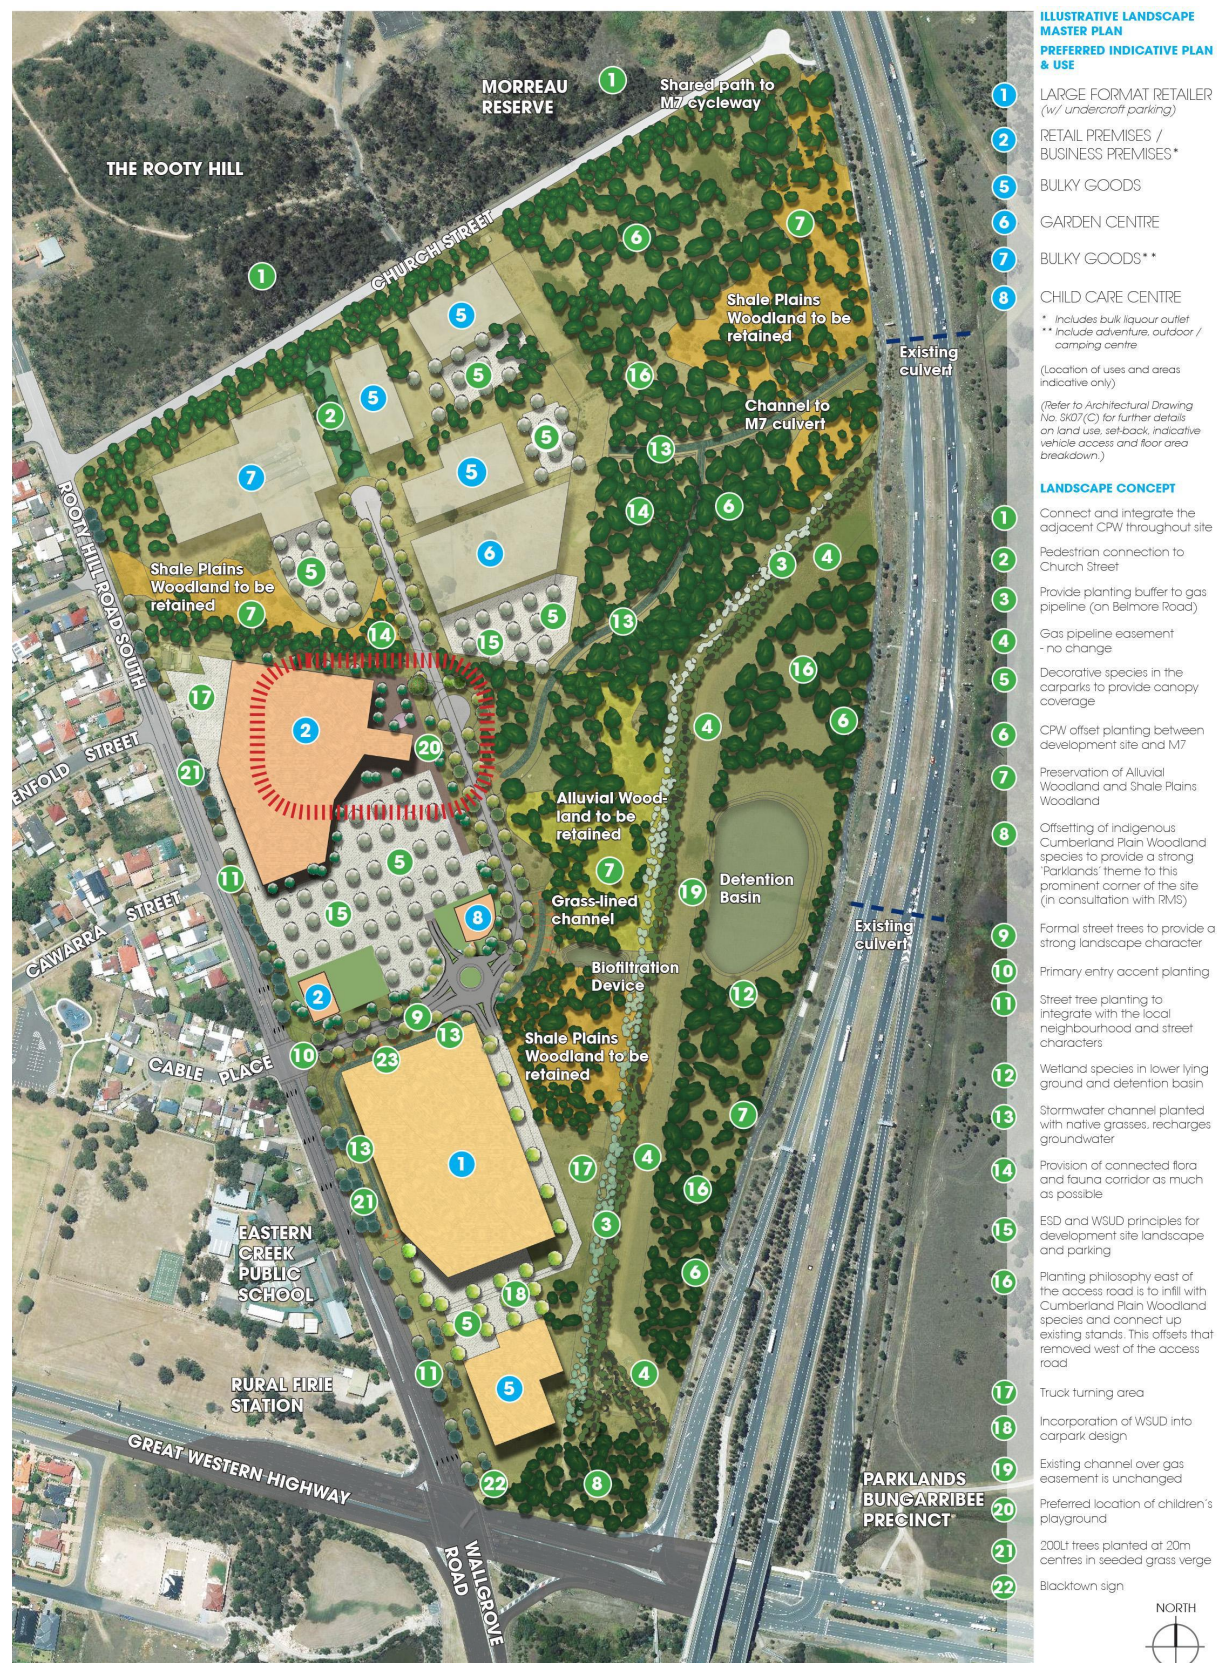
Illustrative Landscape Master Plan (Group GSA)
